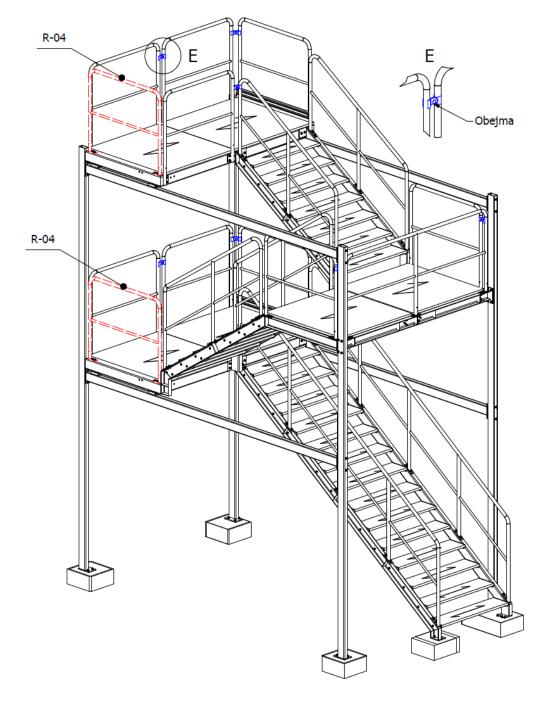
Schematic arrangement of railings and brackets for the variant B
